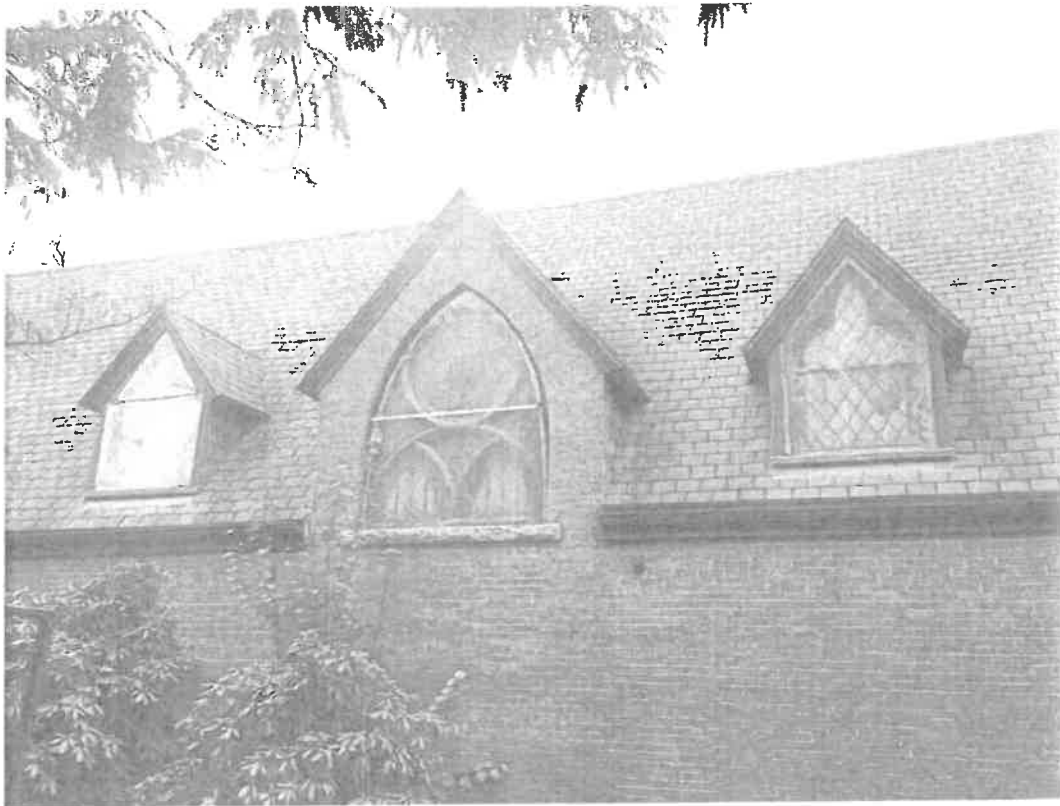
Chapel Addition Gable Windows (East elevation) - December, 2022
